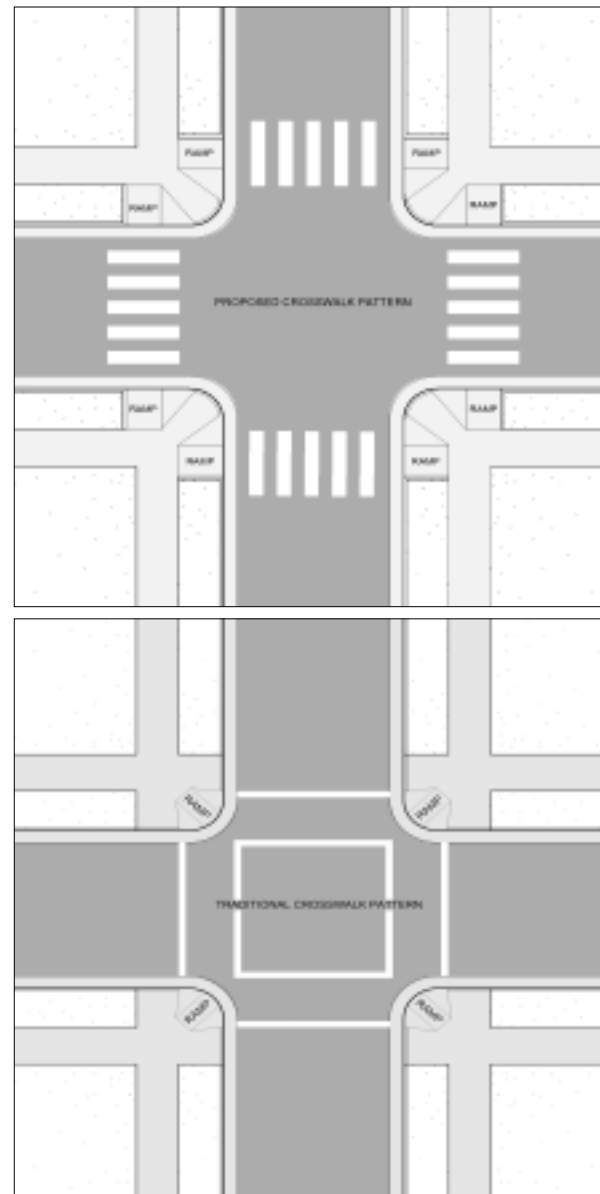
To ensure that crossing distances are minimized and that ramps are on the same alignment as crosswalks, corners should include curb ramps for both crosswalks, as shown at top. Diagonal curb ramps, as shown at bottom, require wheelchair users to re-align their wheelchair while in the street in order to remain in the crosswalk.
